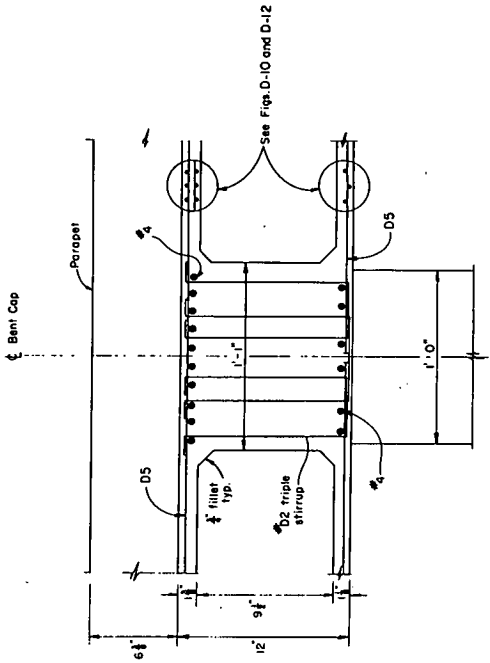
Section of Bent Cap in Double-Column Model Bridge
